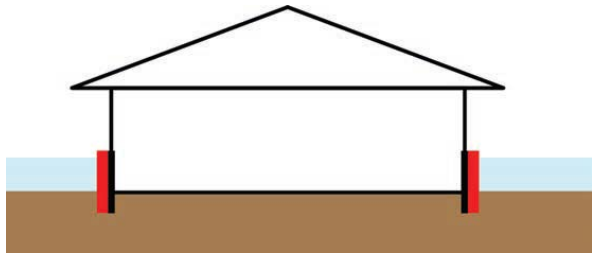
Dry Floodproofing New Construction* (NYC Department of Planning 2013a)
